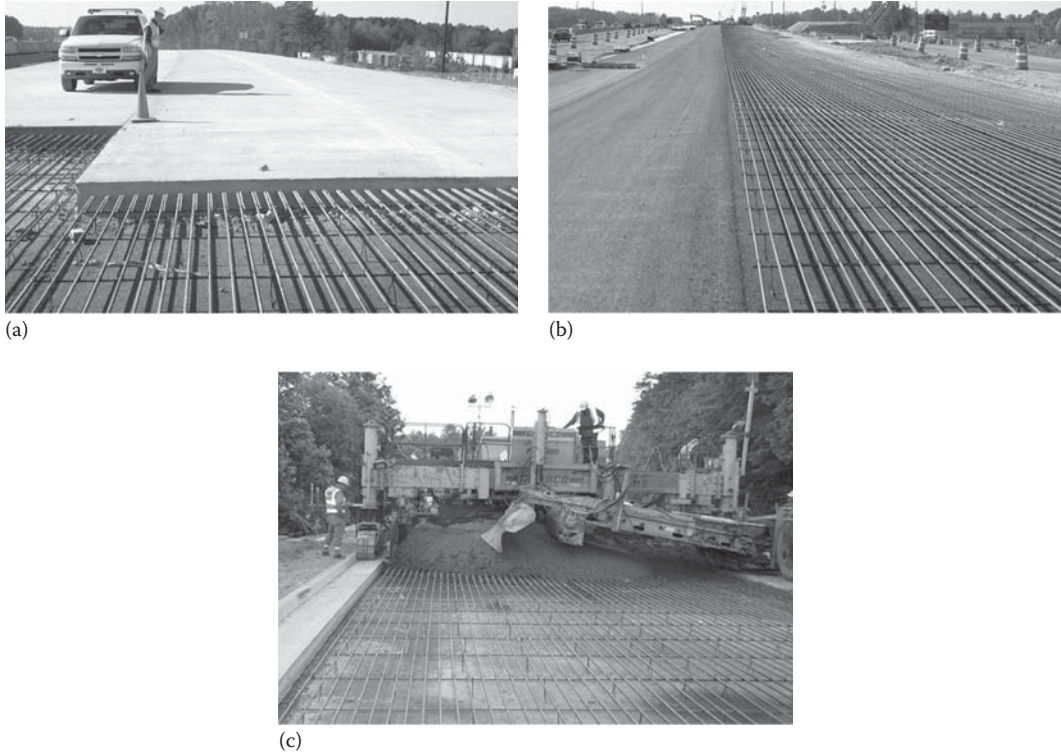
Continuously reinforced concrete pavements (CRCP) (a) under construction, (b) rebar being set on an asphalt bonded base, and (c) CRCP under slipform construction.
